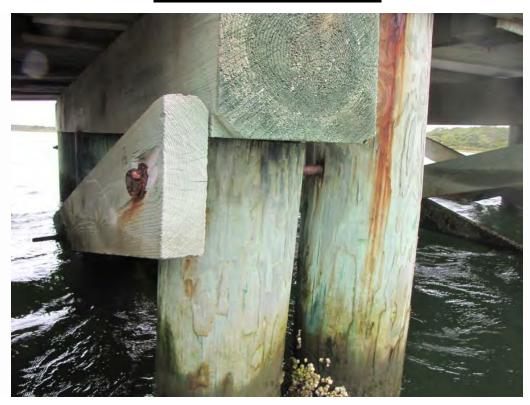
North bent fastener, isolated head of bolt starting to mushroom
